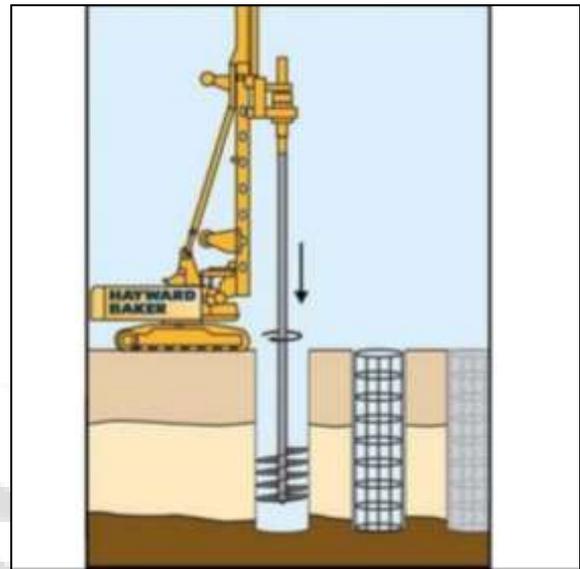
Drilled Shafts or Caisson Foundation (Source: Hayward Baker)
